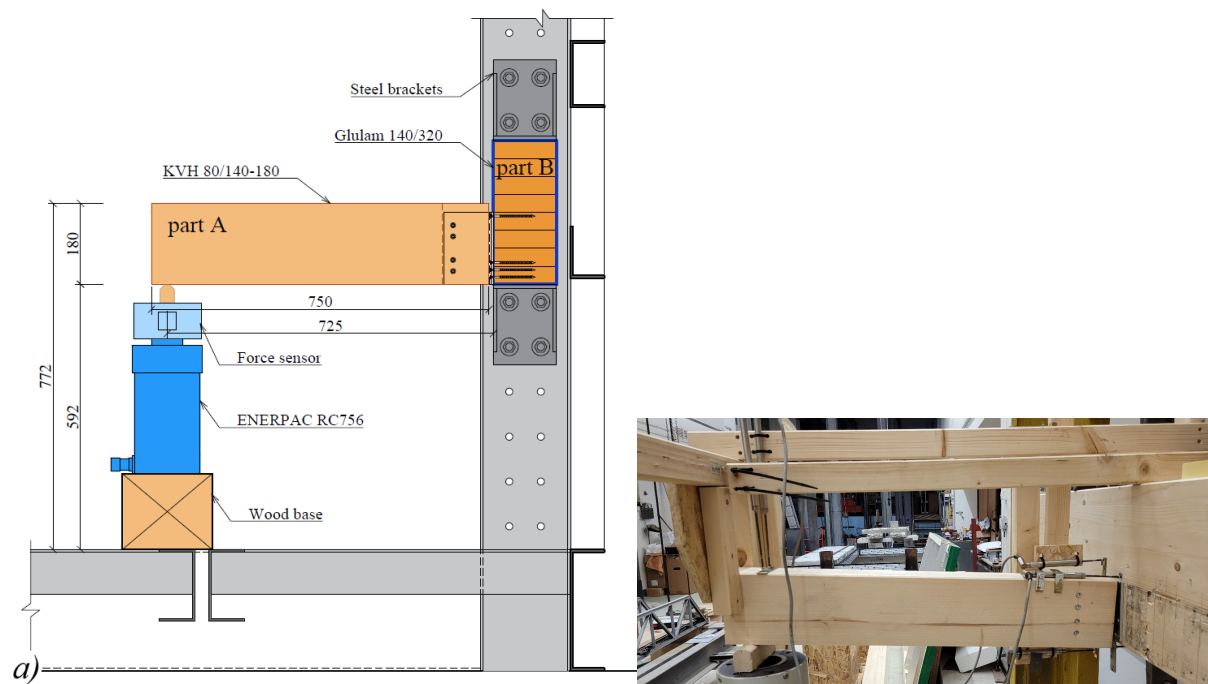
a) Specimen loading assembly (dimensions in mm). b) The experiment set-up.
